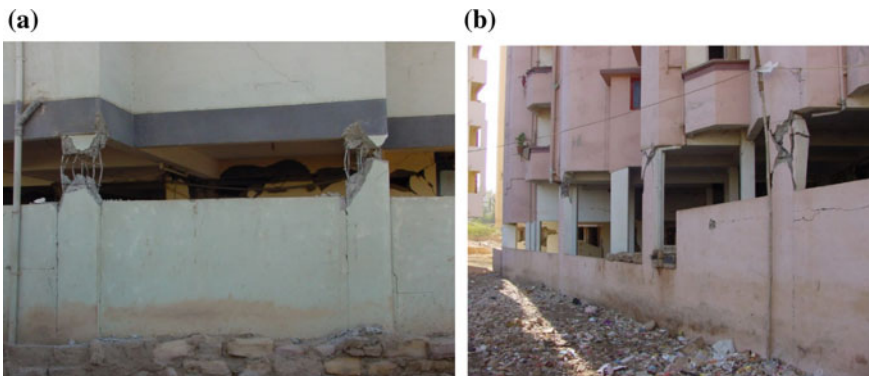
a Damage to columns of buildings with varying lateral supports from masonry infills; b shear failure in short columns and flexure/shear failure in others [10]
